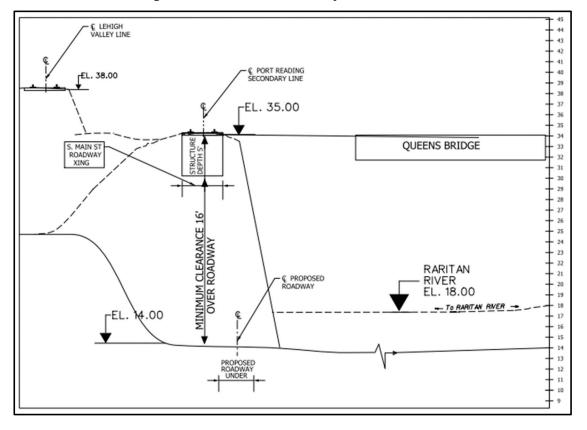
Alternative 2.0 Surface Water Elevation Issue
